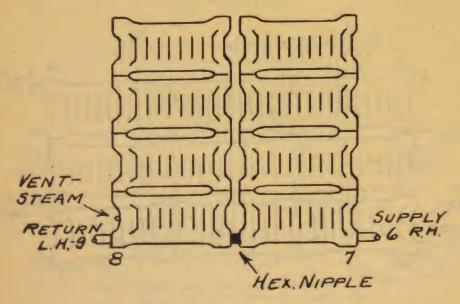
Assembled in two or more stacks. One and two pipe steam only. Bottom feed only.
